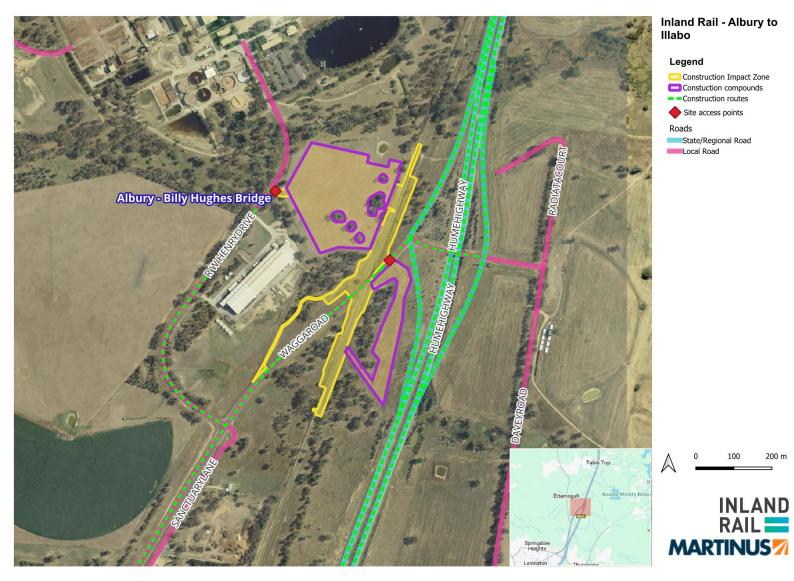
BILLY HUGHES BRIDGE CONSTRUCTION ROUTES
